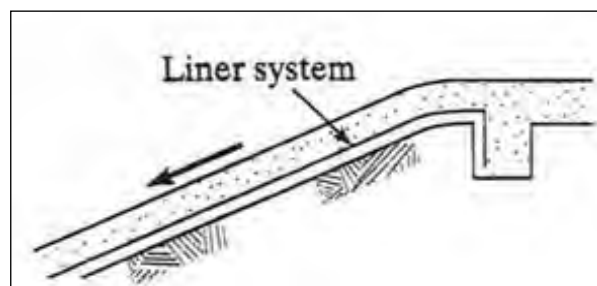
Failure of liner system components from anchor trenches
